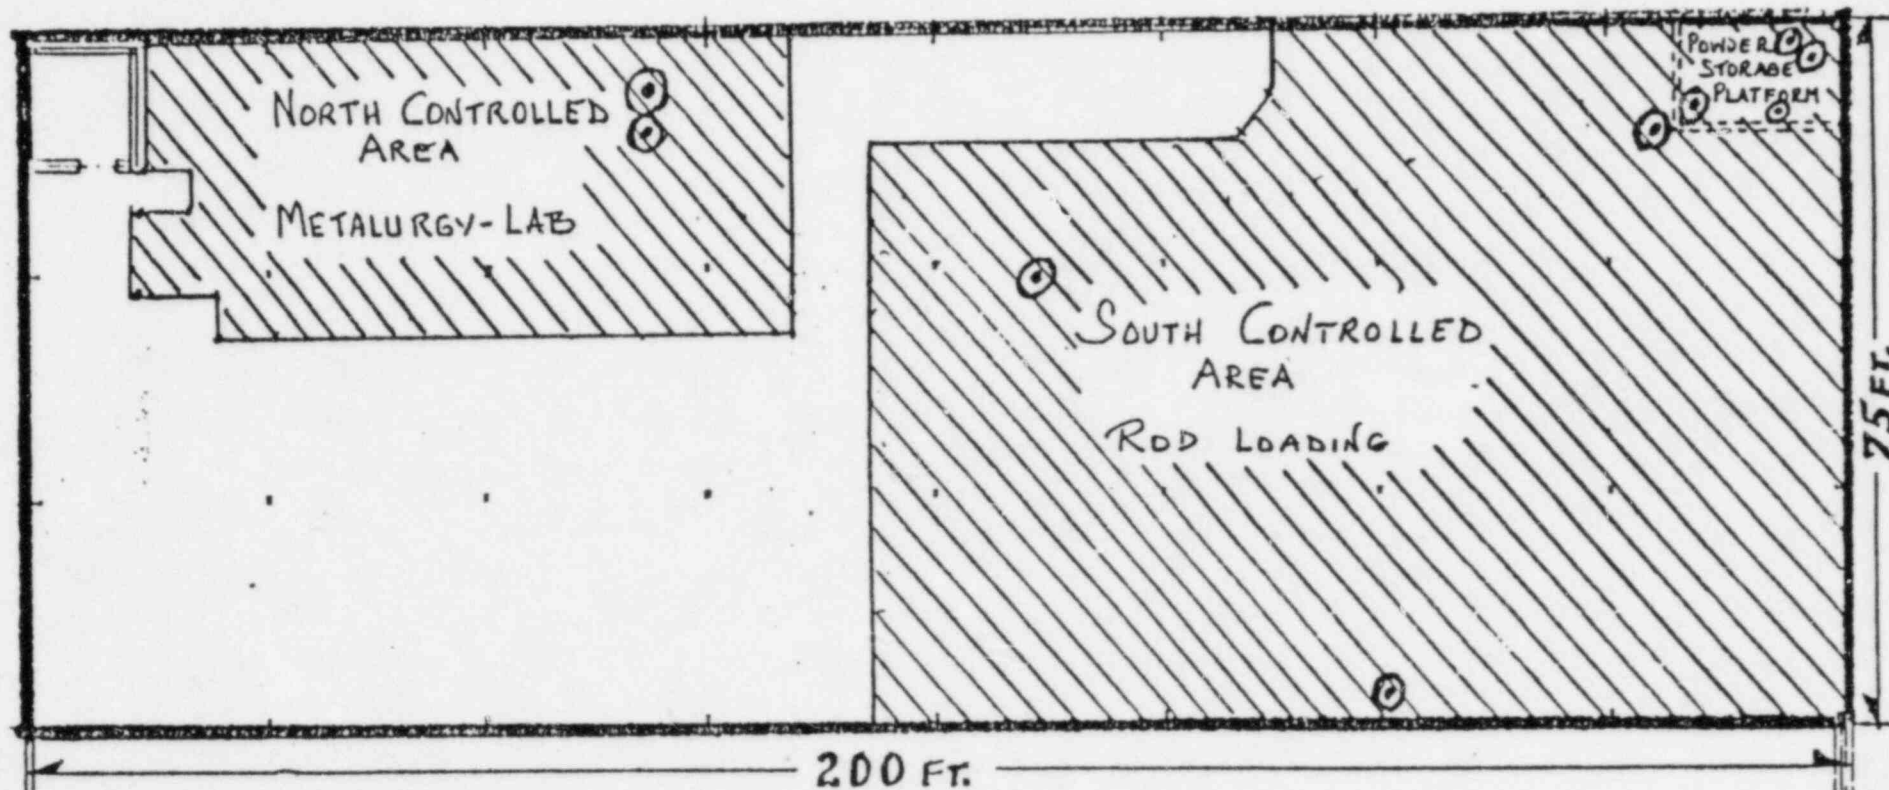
BUILDING "H" 1ST. FLOOR CONTROLLED AREAS
